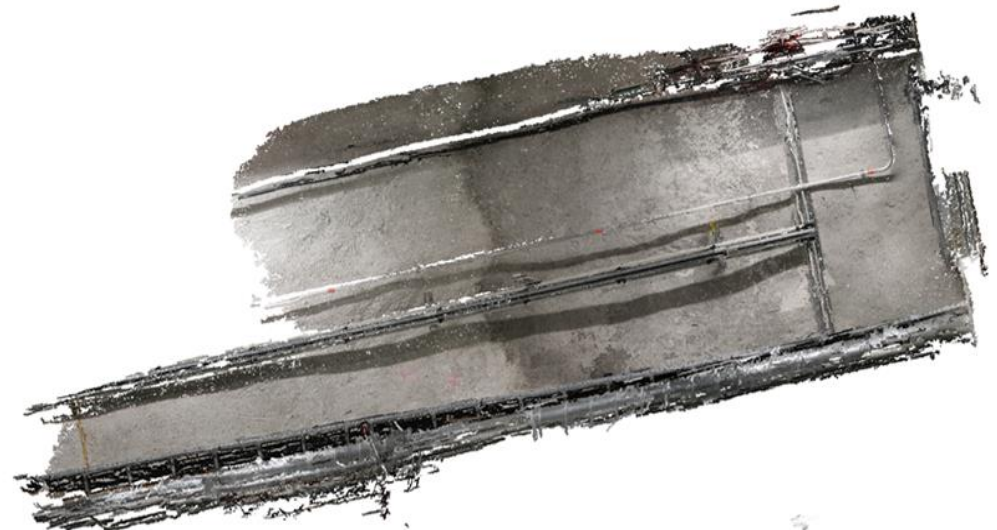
Below view of tunnel ceiling reconstructed from robot camera images
